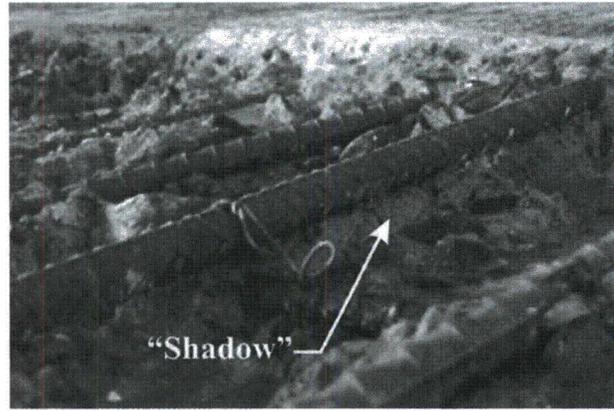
"Shadow" under the rebar (note tie wire undamaged and in excellent condition)
